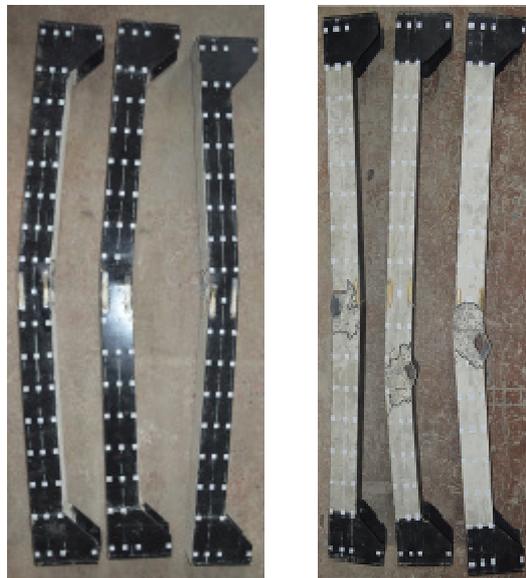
The nature of the destruction of experimental steel-concrete samples with sheet reinforcement of the series SB-PD-17-1..3 and SB-PN-17-1..3
